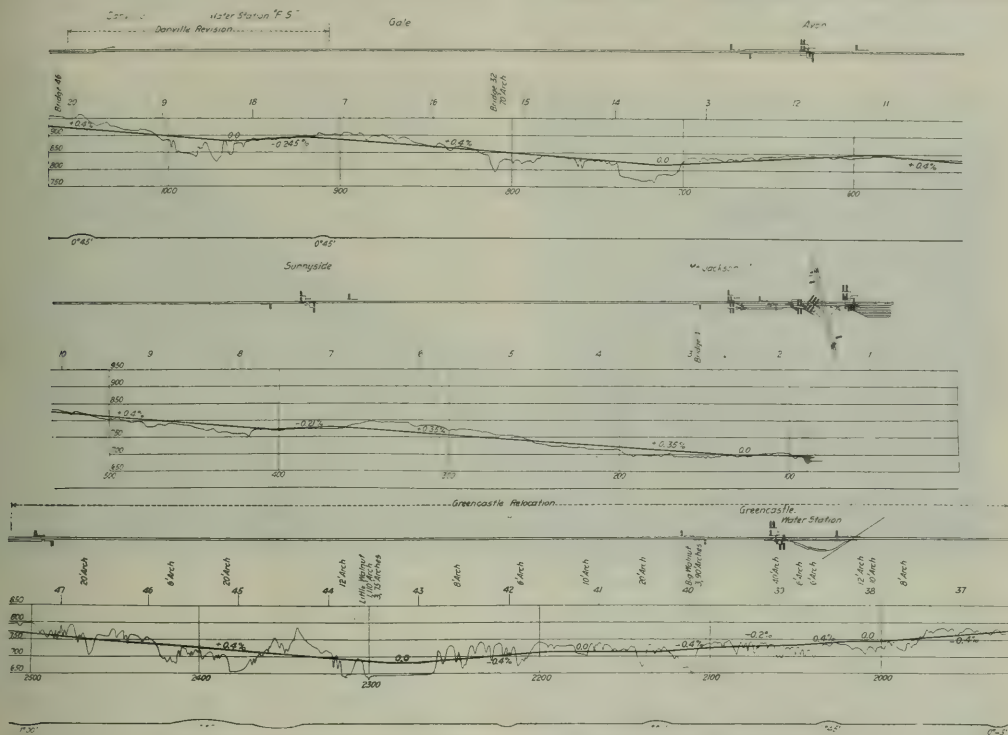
Plans and Profiles of Sections of St. Louis Division Reconstruction.
